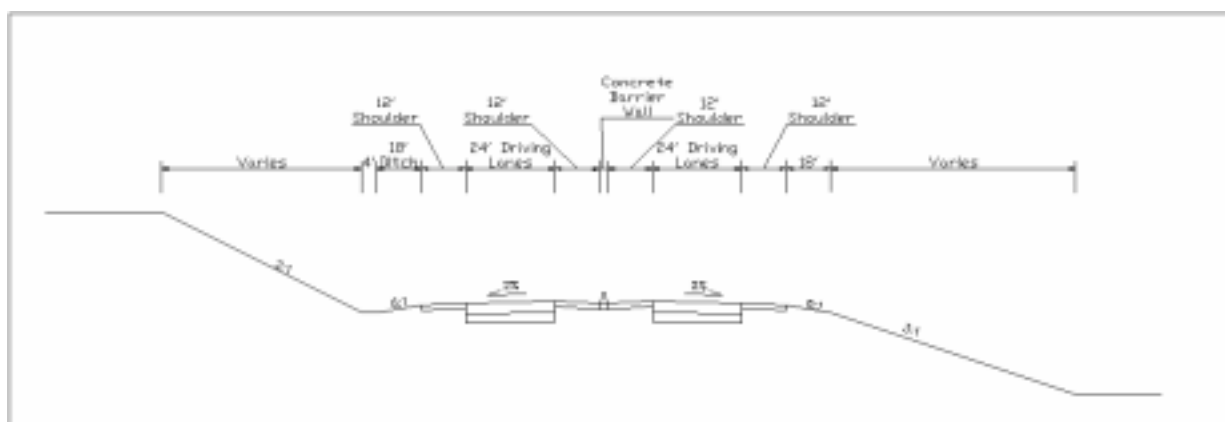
TYPICAL CROSS SECTION WITH A CONCRETE BARRIER WALL
